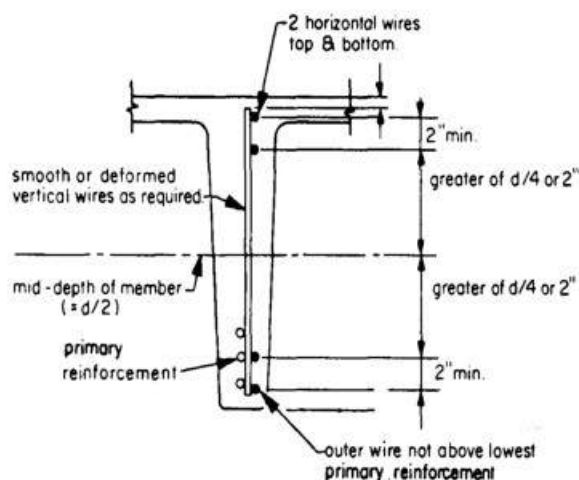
1—Anchorage of Single-Leg Welded Wire Reinforcement Shear Reinforcement, ACI 318-14
